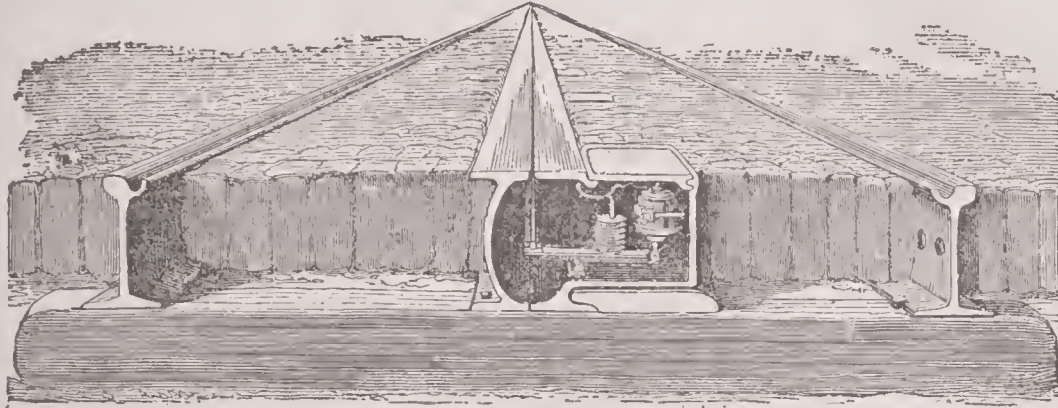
UNDERGROUND ELECTRIC RAILWAY—SINGLE TRACK.
